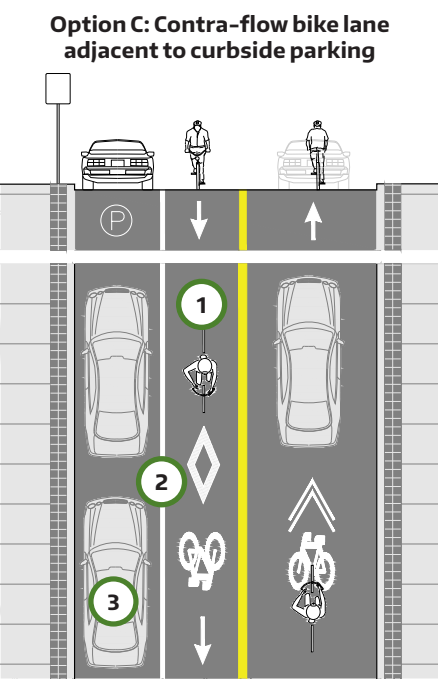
Plan view and street section of a contra-flow lane adjacent to curbside parking.
